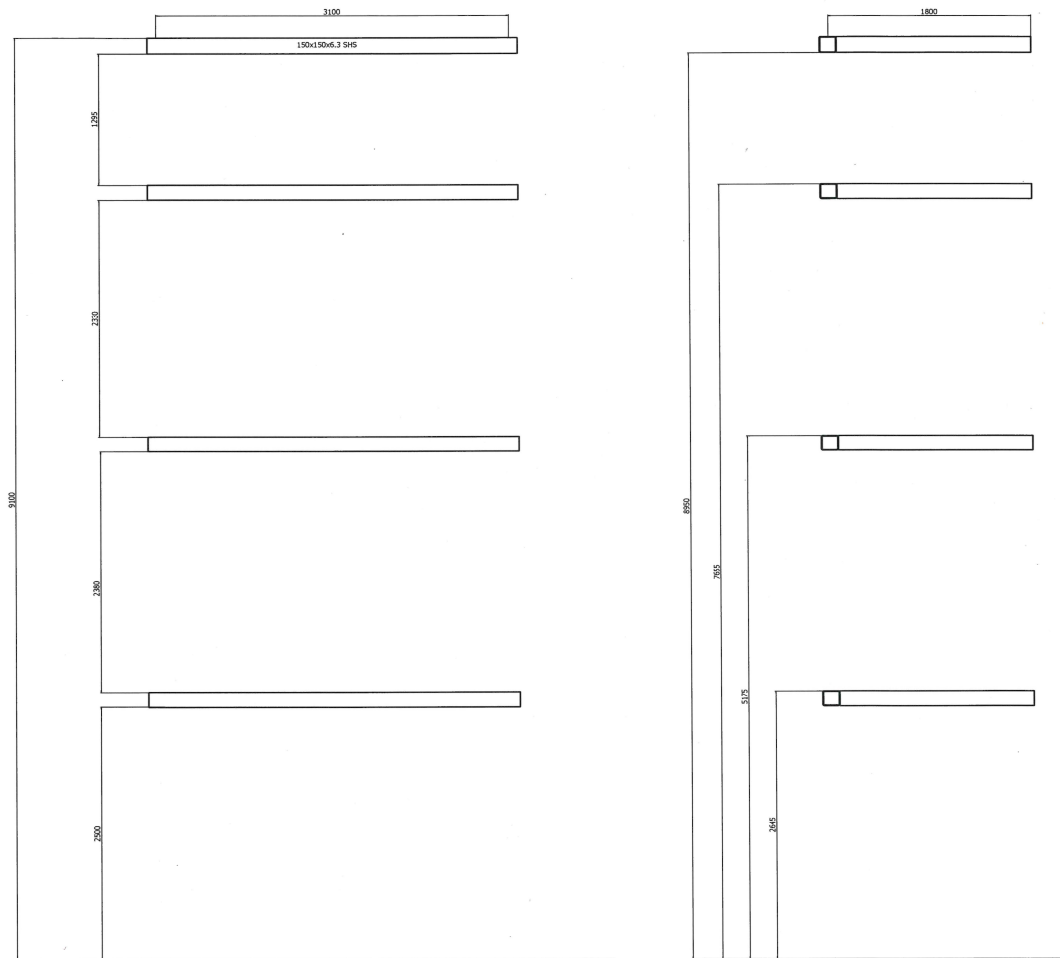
Client supplied drawing – Frame layout showing box sections at floor level.
